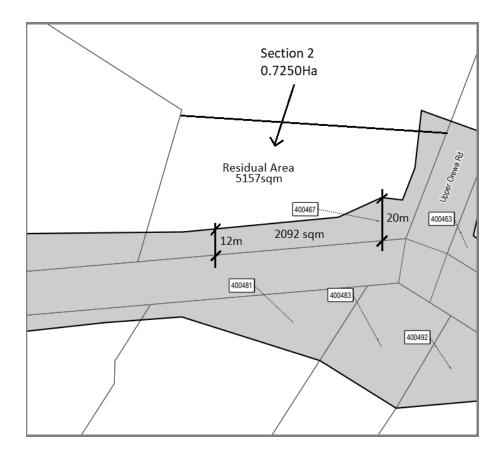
Plan showing proposed designation and land areas affecting Submitter's Property
